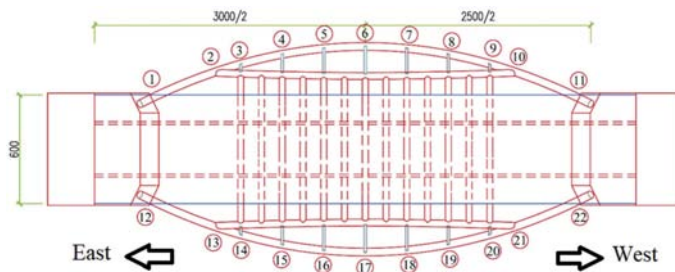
Top view of the bridge with the cross sections of ultrasonic testing labeled (units in mm).
